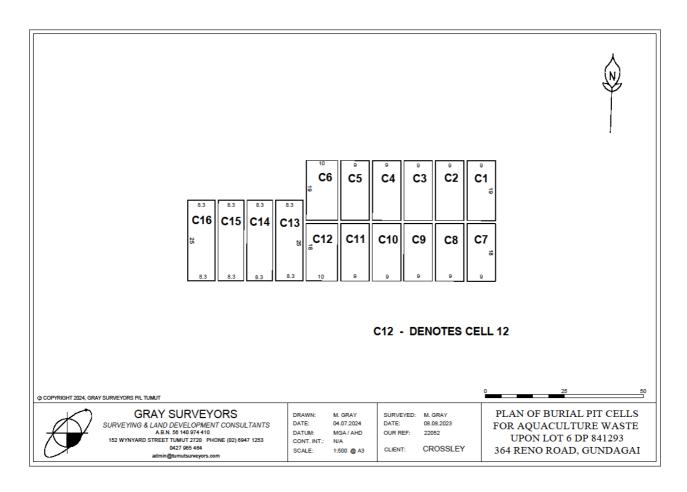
Plan of Burial Pit Cells (order of cells to be used)
